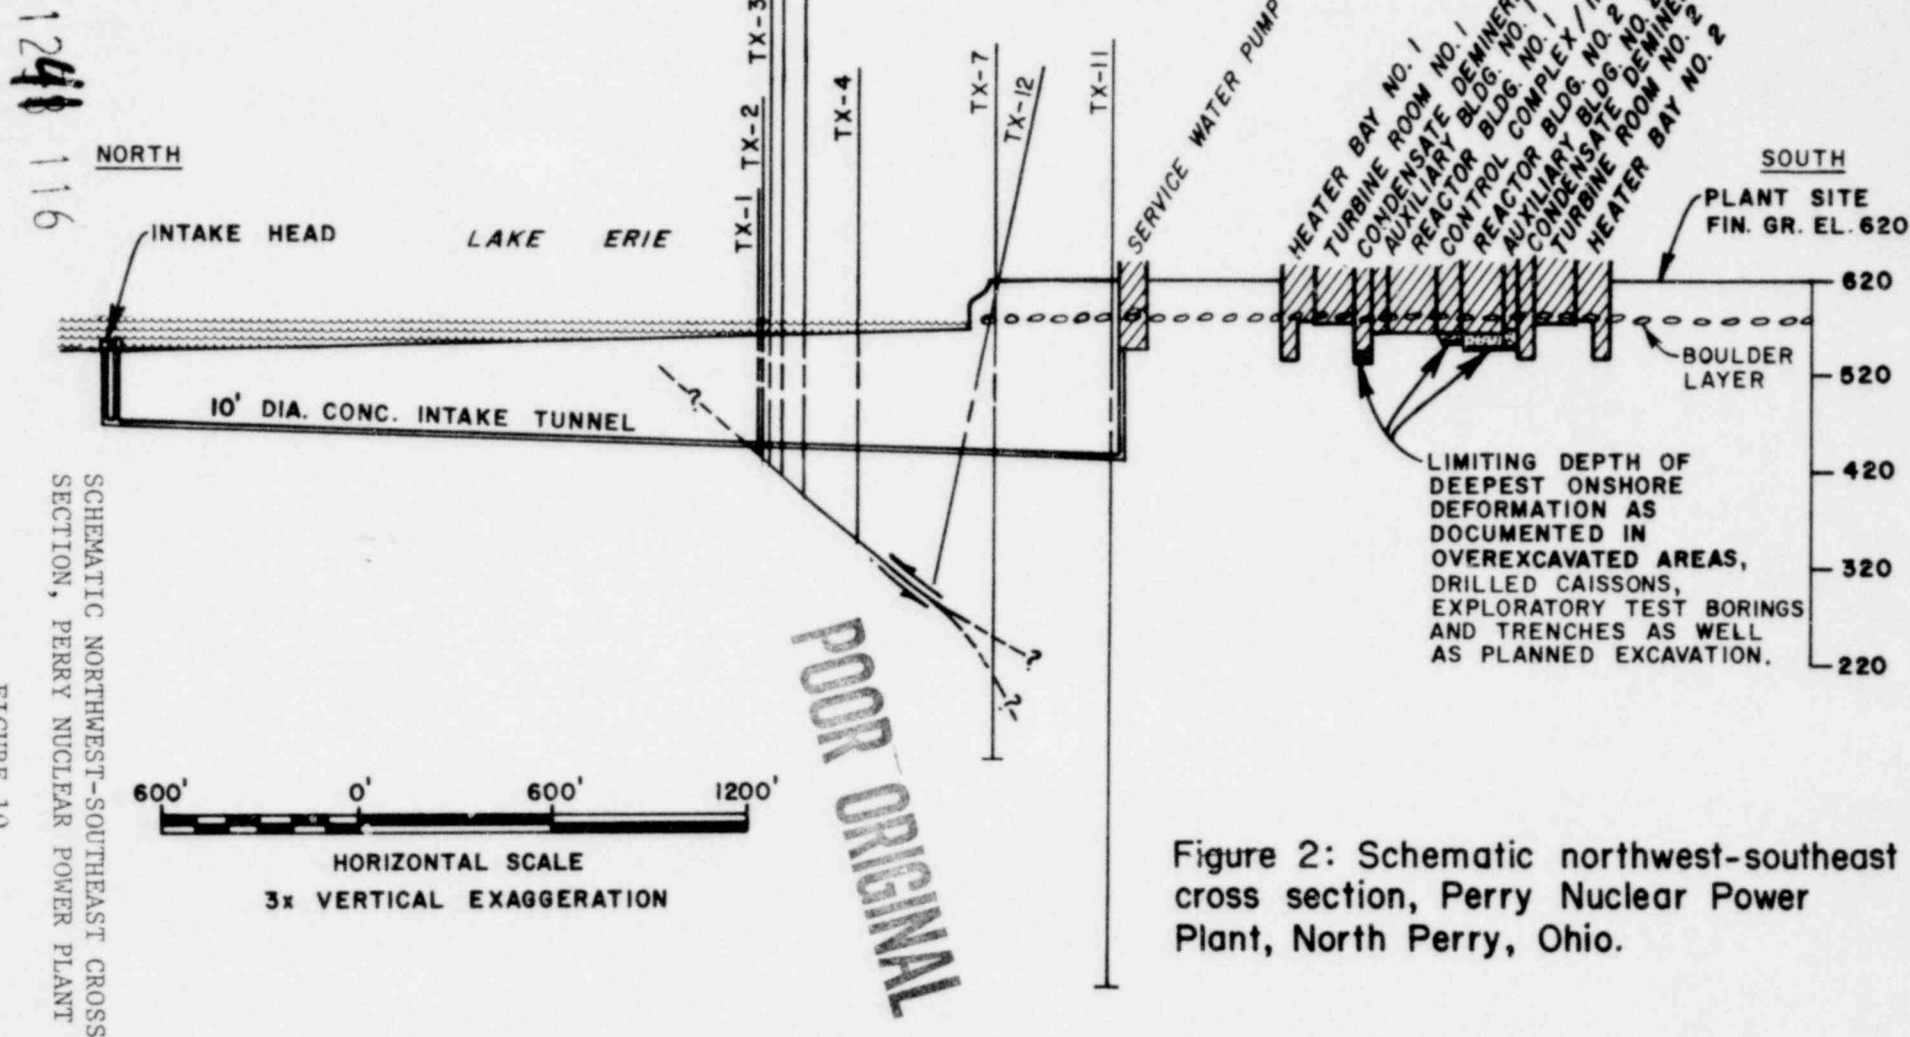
Schematic northwest-southeast cross section, Perry Nuclear Power Plant, North Perry, Ohio.
